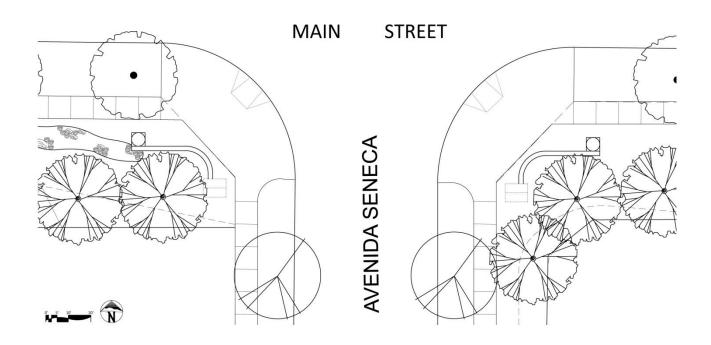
Secondary Village Entry Concept Plan (Main Street @Avenida Seneca)
